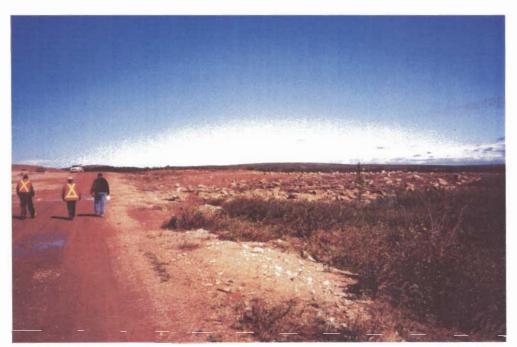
Old waste stock pile (right side - east of the road). Photo is looking north. Waste rock has been removed to the east side of the road. Note that some natural boulders were left at the old site.
